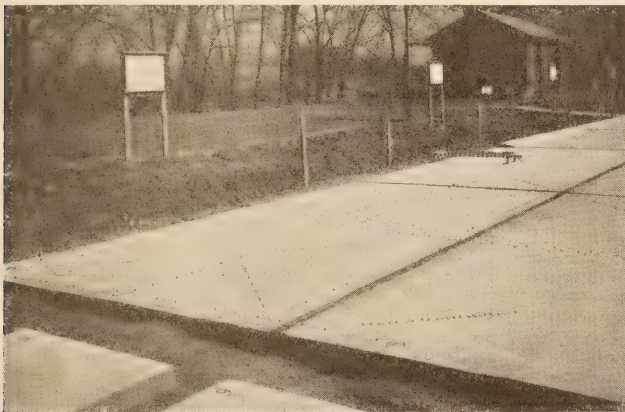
COMPLETE INSTALLATION OF GAGE POINTS FOR STRAIN AND DEFLECTION MEASUREMENTS ON ONE OF THE TEST SECTIONS.
